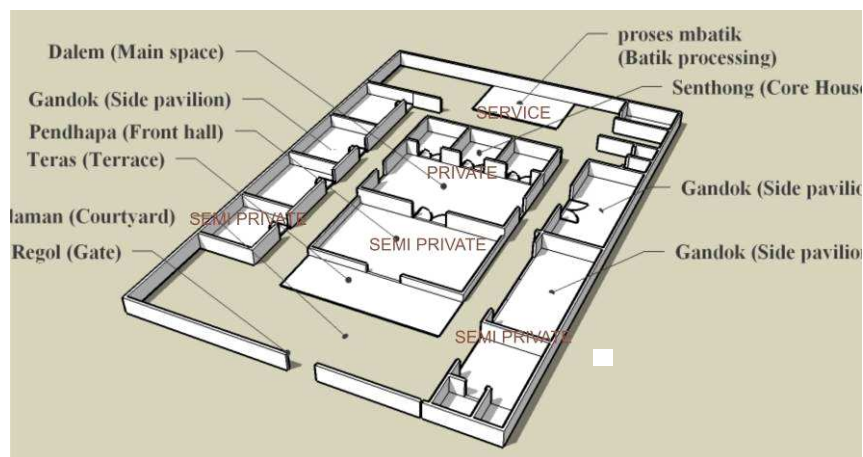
Sample [B] of the Javanese house: Original plan.
